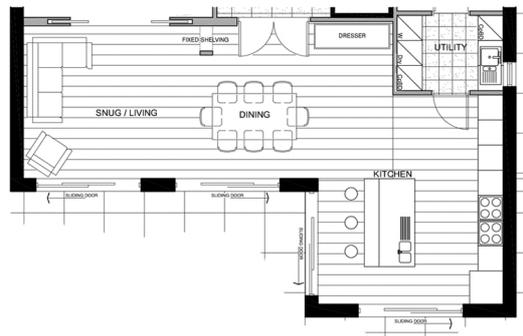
| an example of effective open plan living whilst maximising inside / outside space
